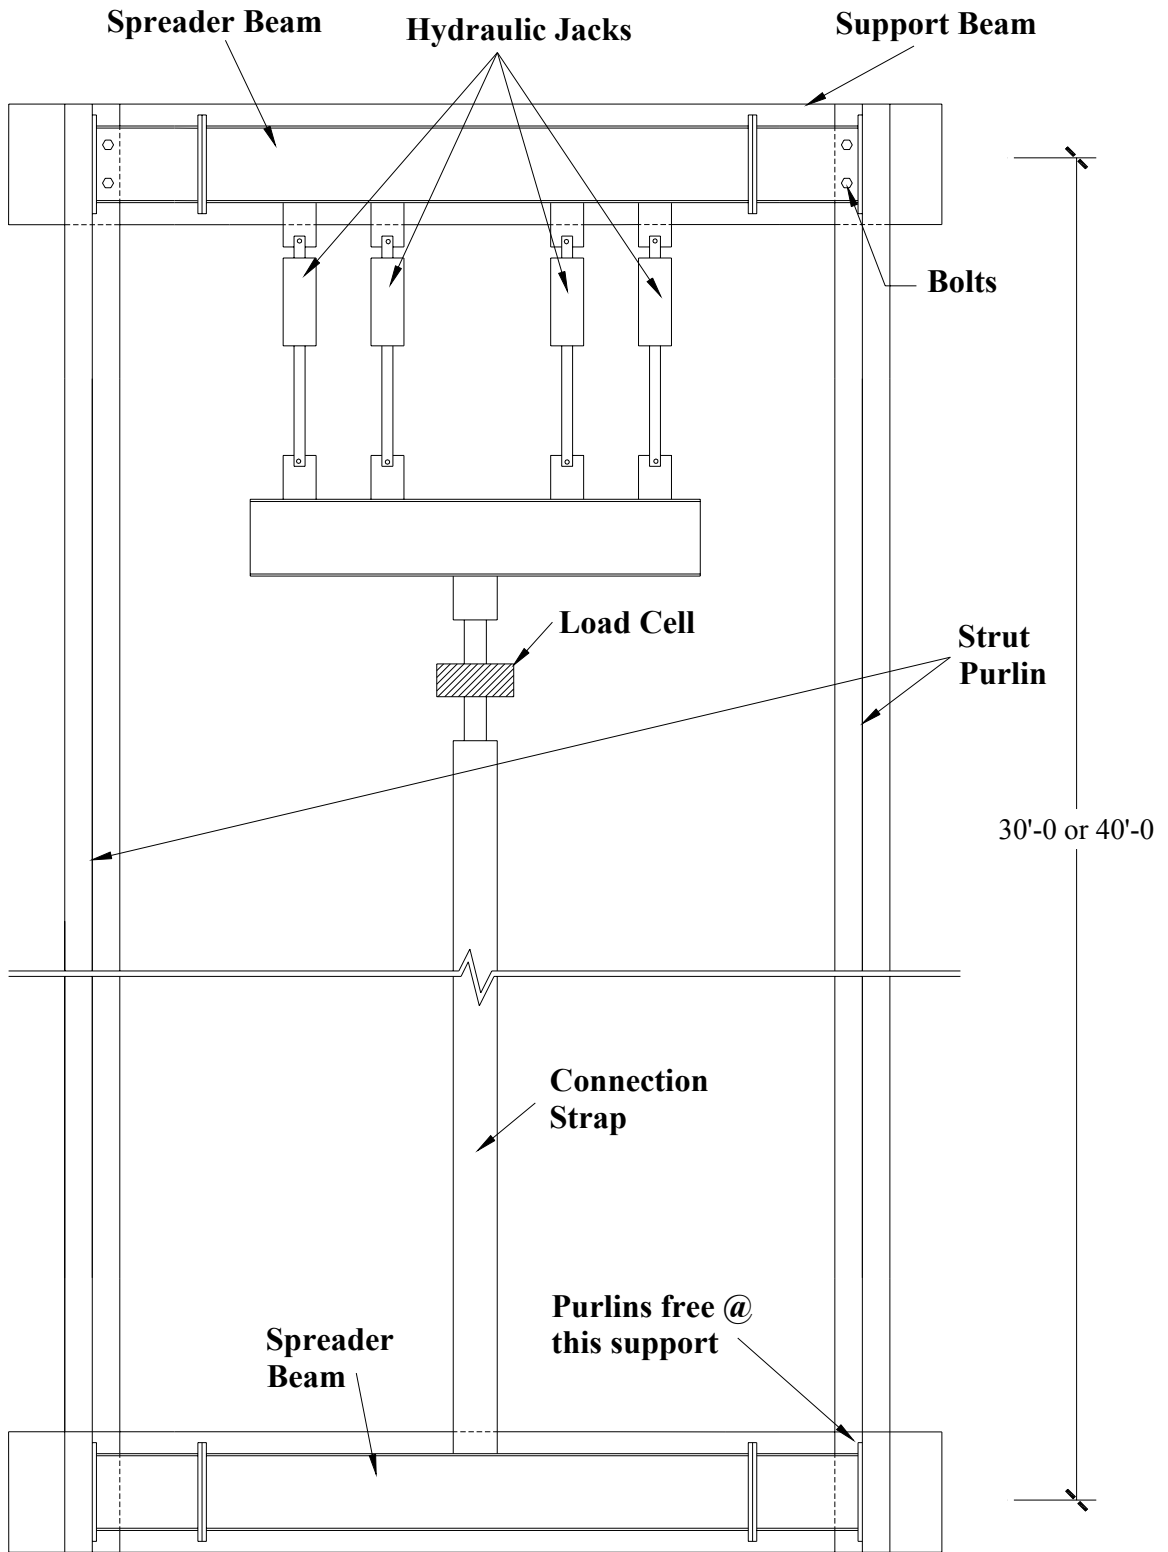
Plan View of Test Setup (2 Purlin w/o Lateral Restraint)
